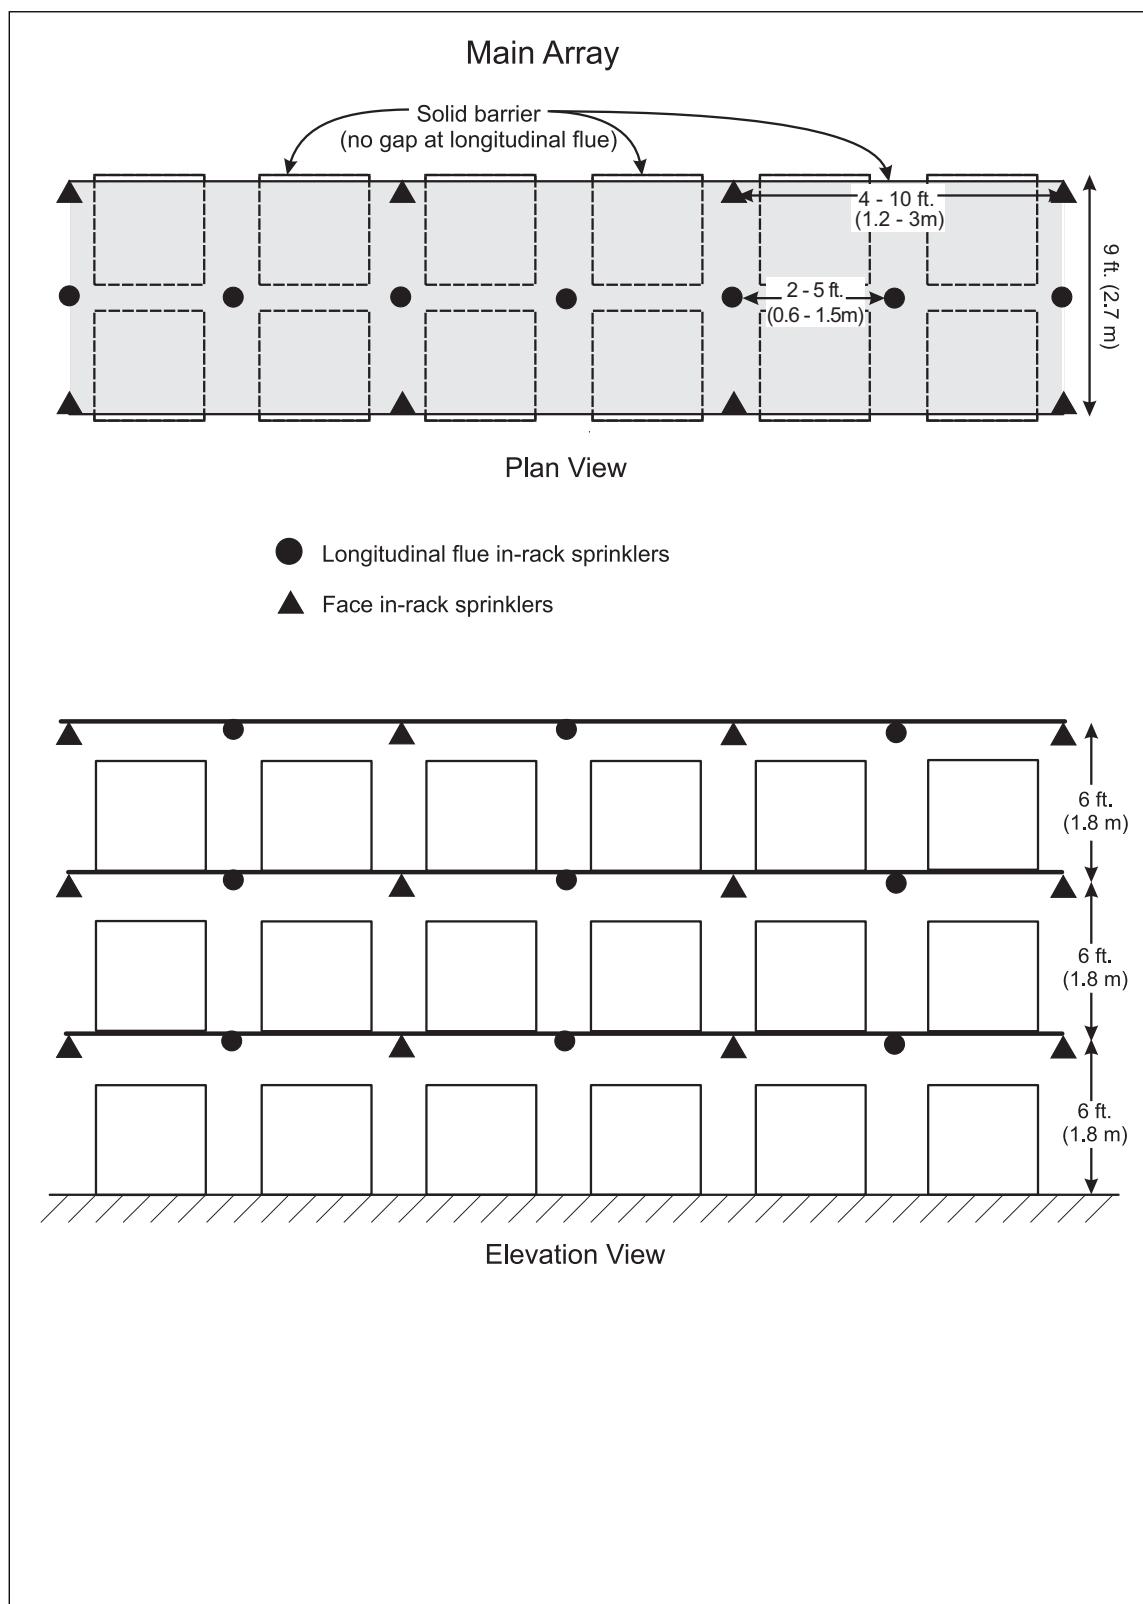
Double-row rack sprinkler layout: fire protection scheme D
